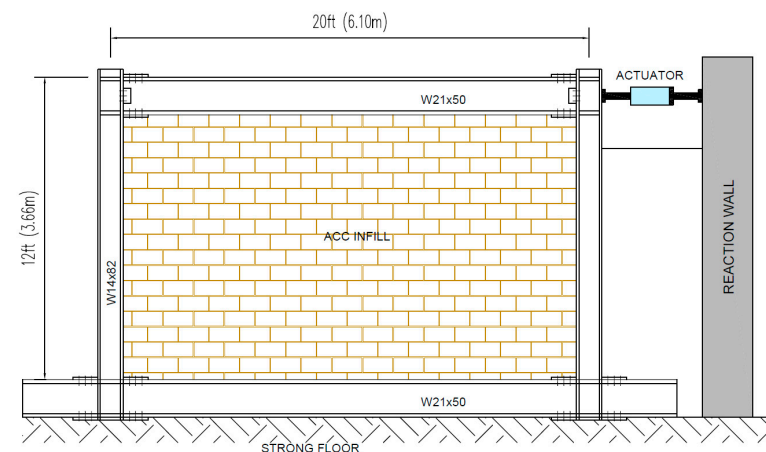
Tested frame with infill masonry according to (adapted from) [42].
